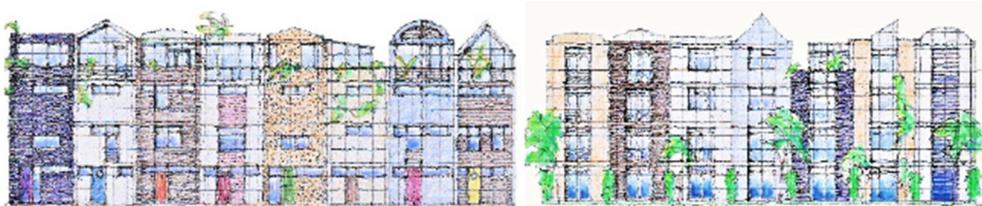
The narrowest facades of 4,5 meter – towards street and garden.
